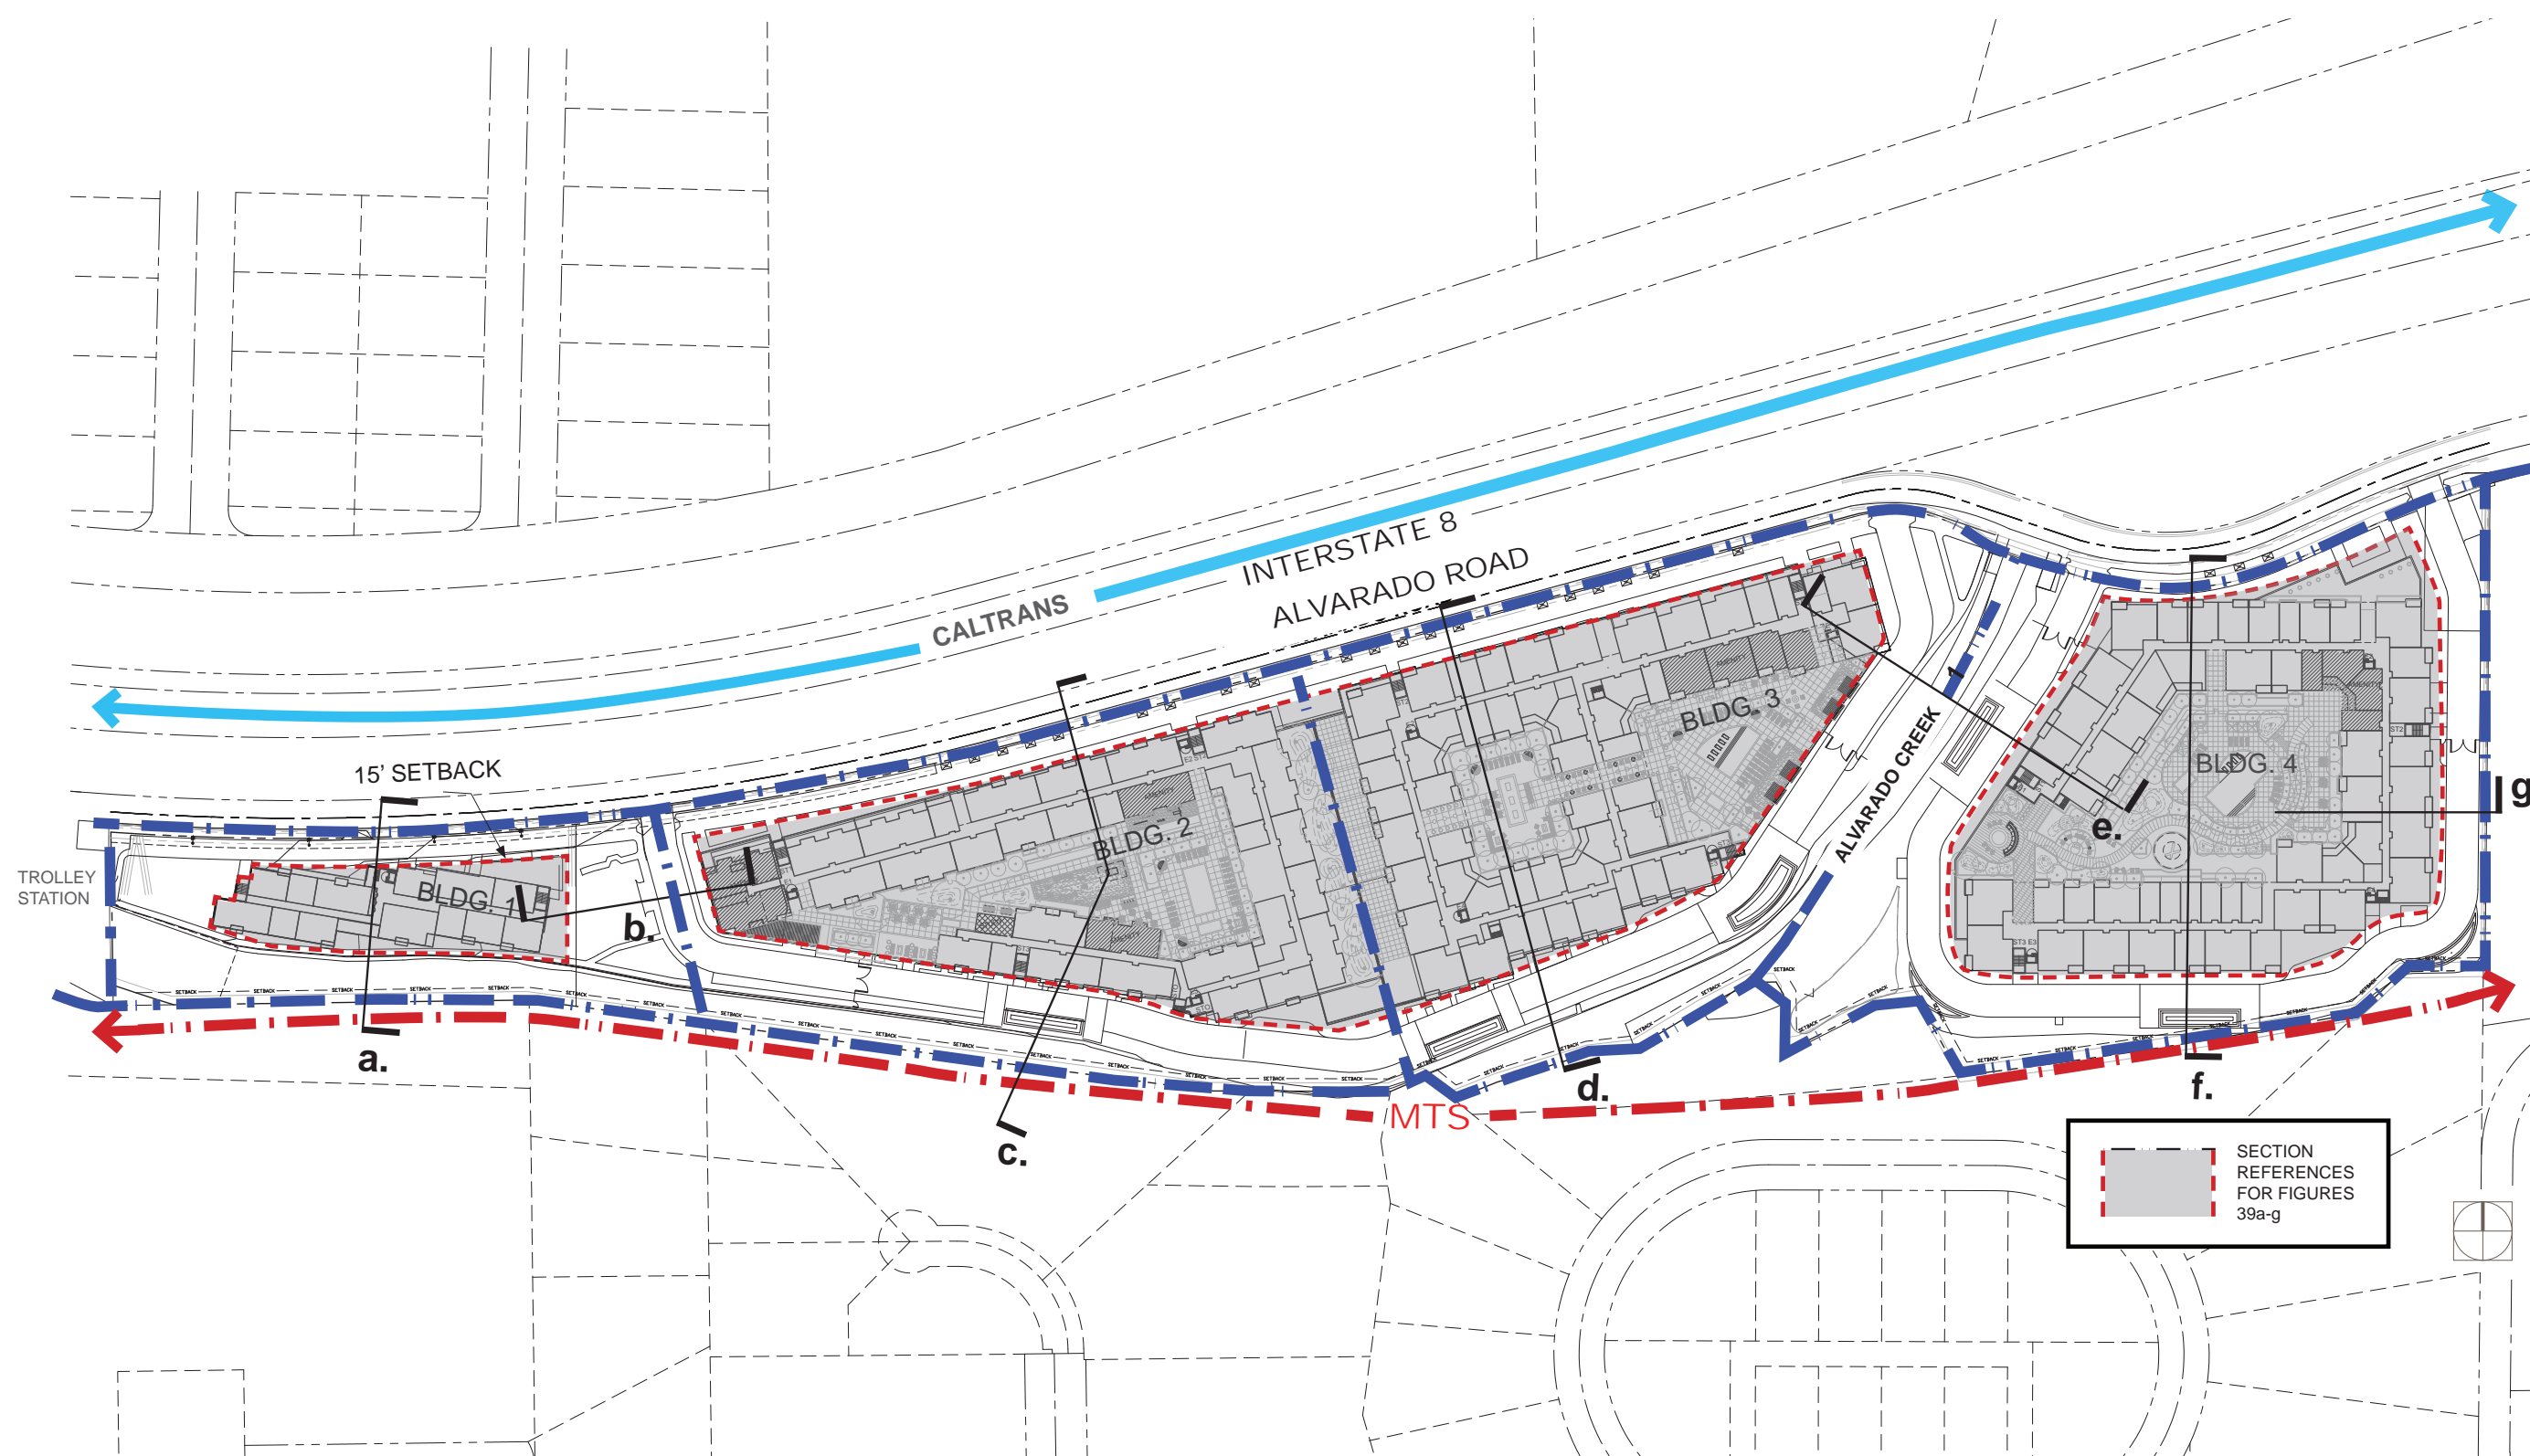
Form-Based Development Standards Plan View Building Area Boundaries and Figure 39a-g Section Lines
